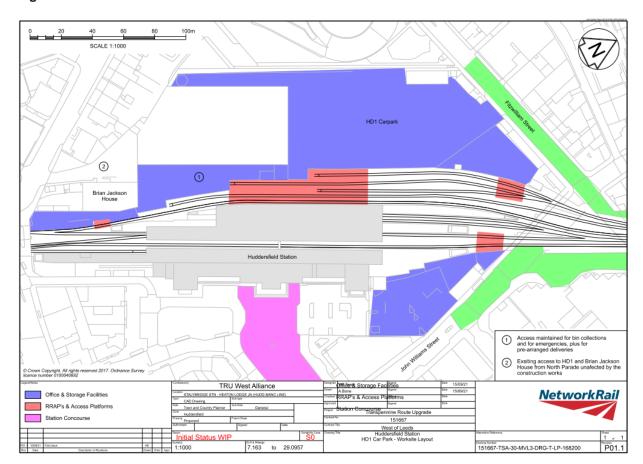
Access maintained to Brian Jackson House and HD1 via North Parade
